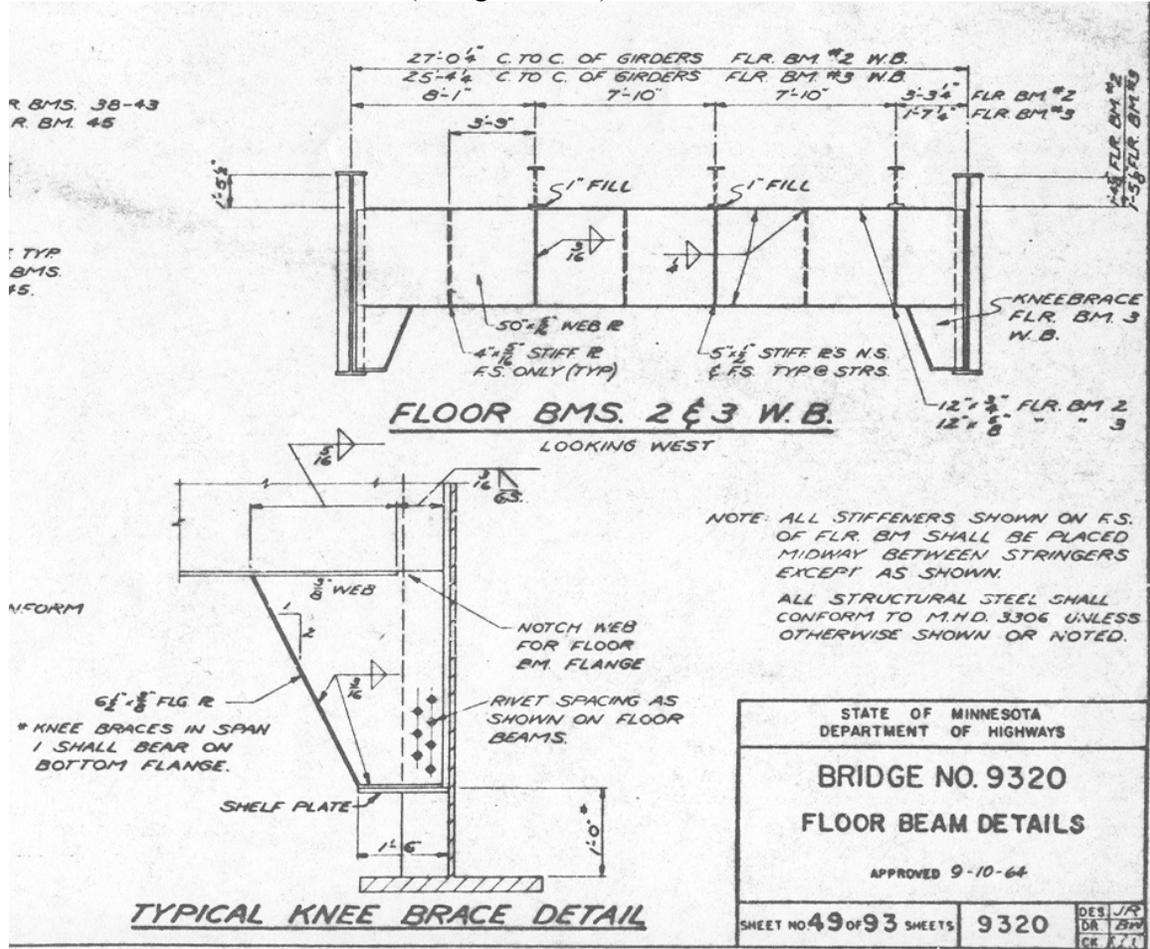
Shelf plate welded to girder web (Bridge # 9320)
